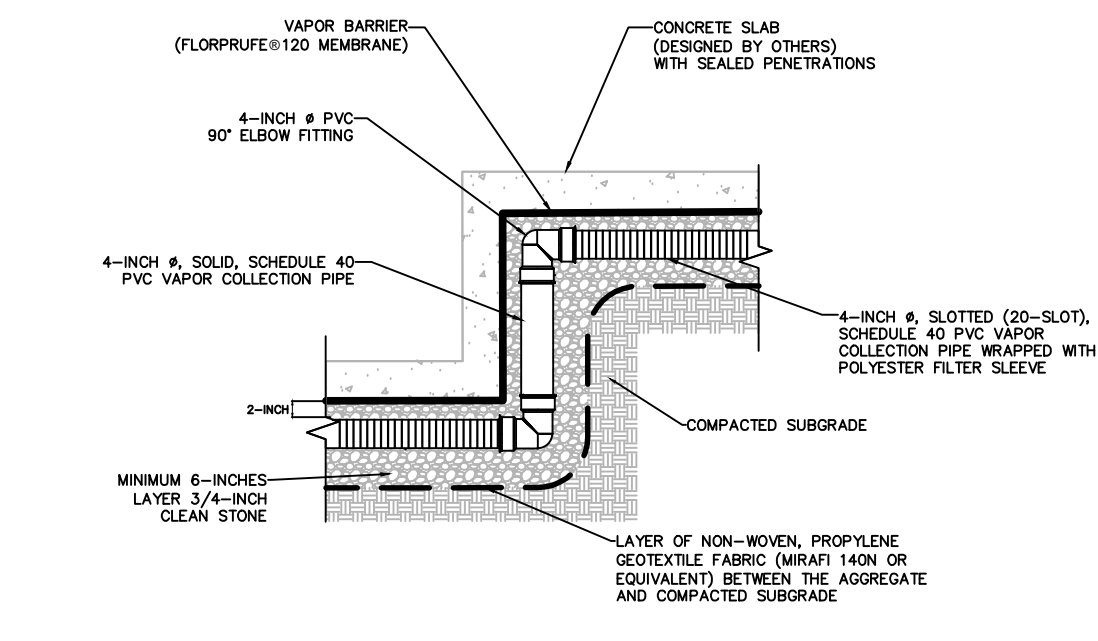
TYPICAL SECTION THROUGH SUB-SLAB
